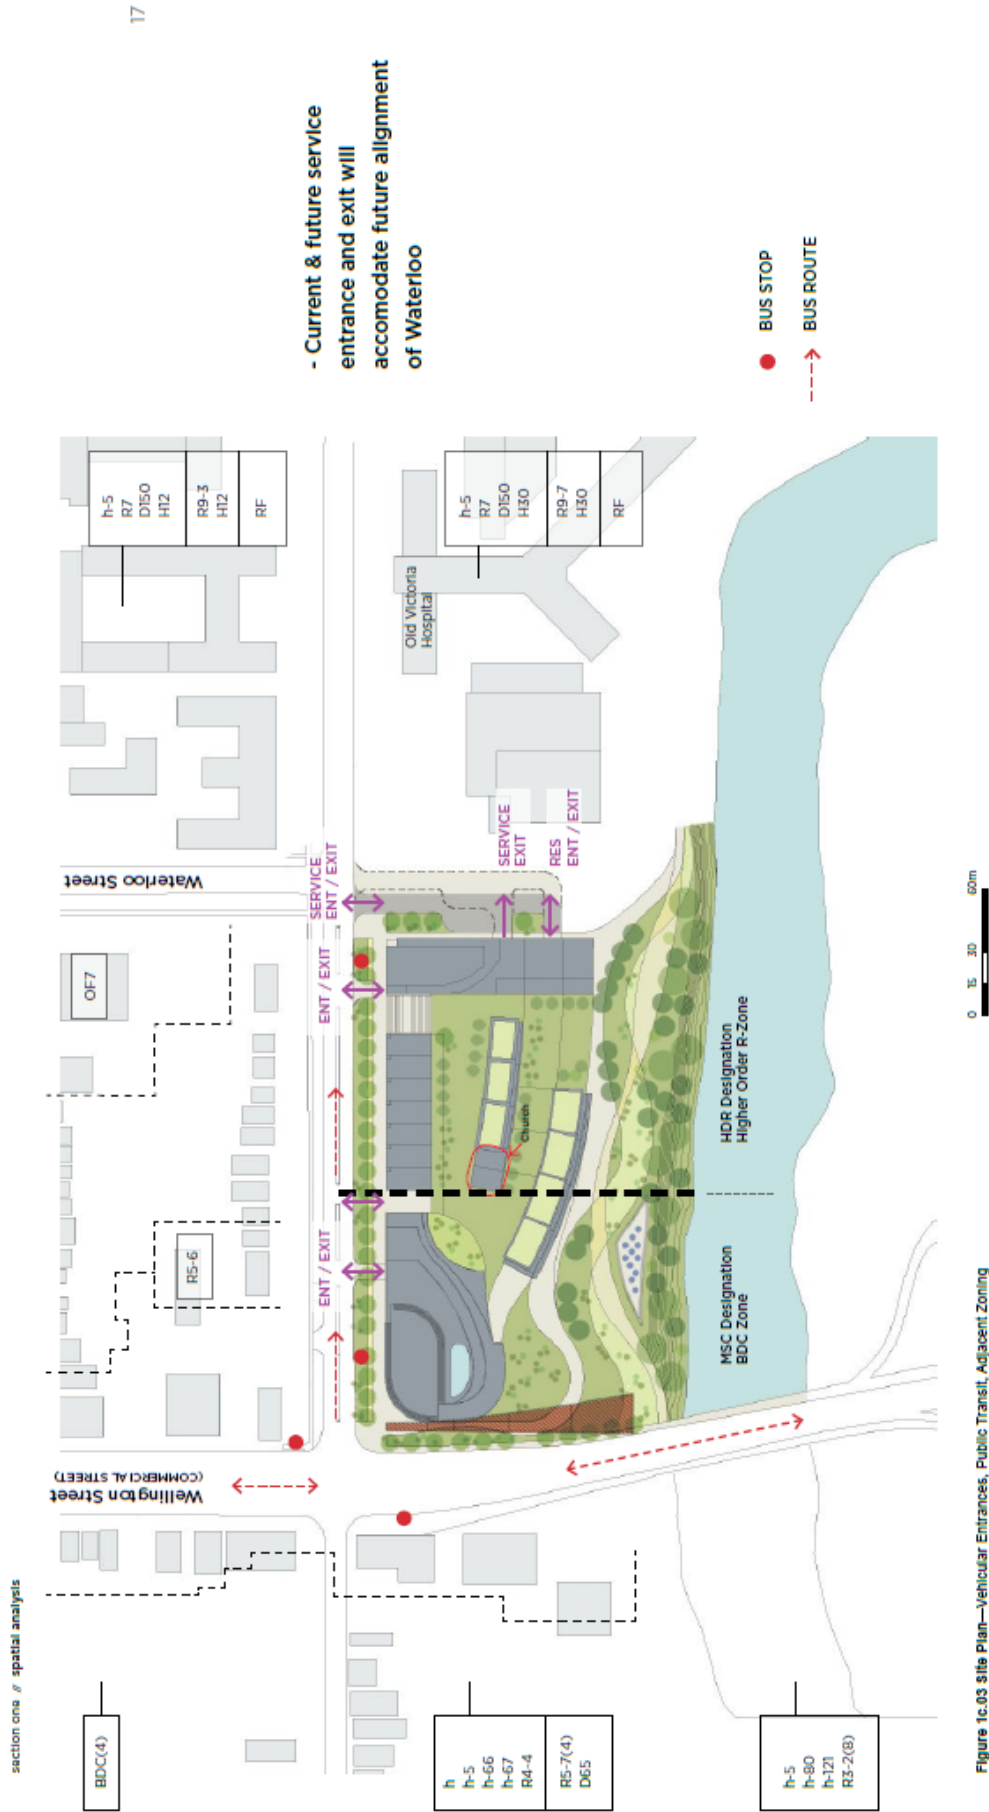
03 Site Plan—Vehicular Entrances, Public Transit, Adjacent Zoning
